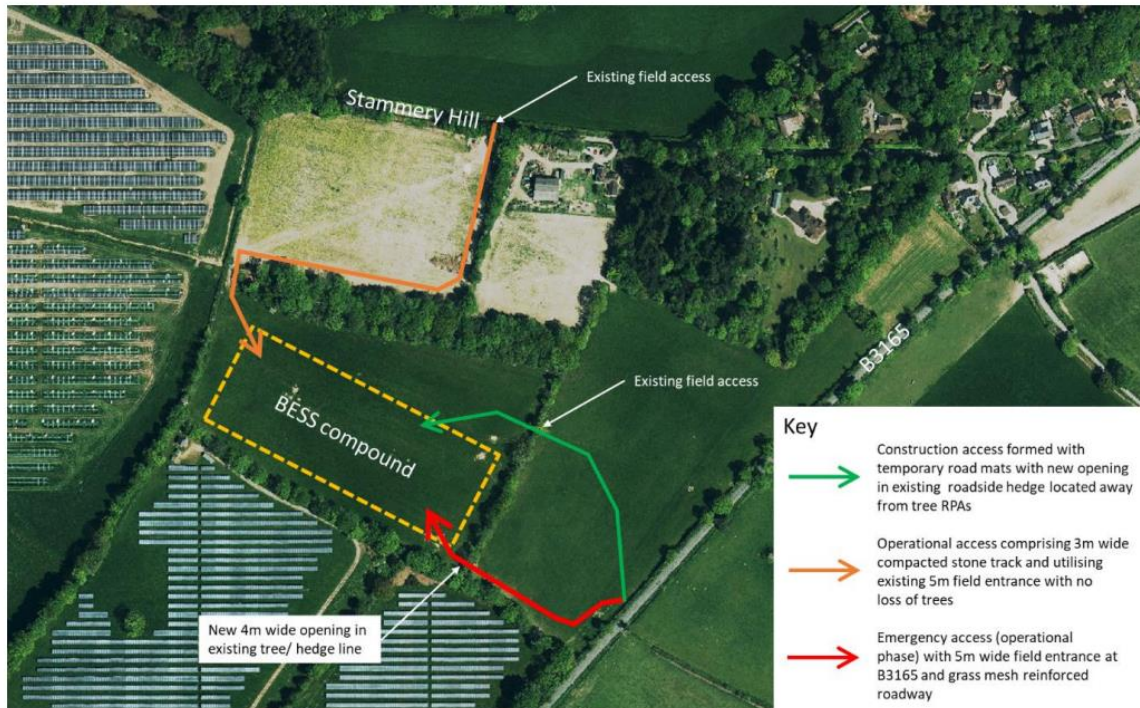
Aerial image of site showing alternative access arrangements to minimise tree and hedgerow loss
